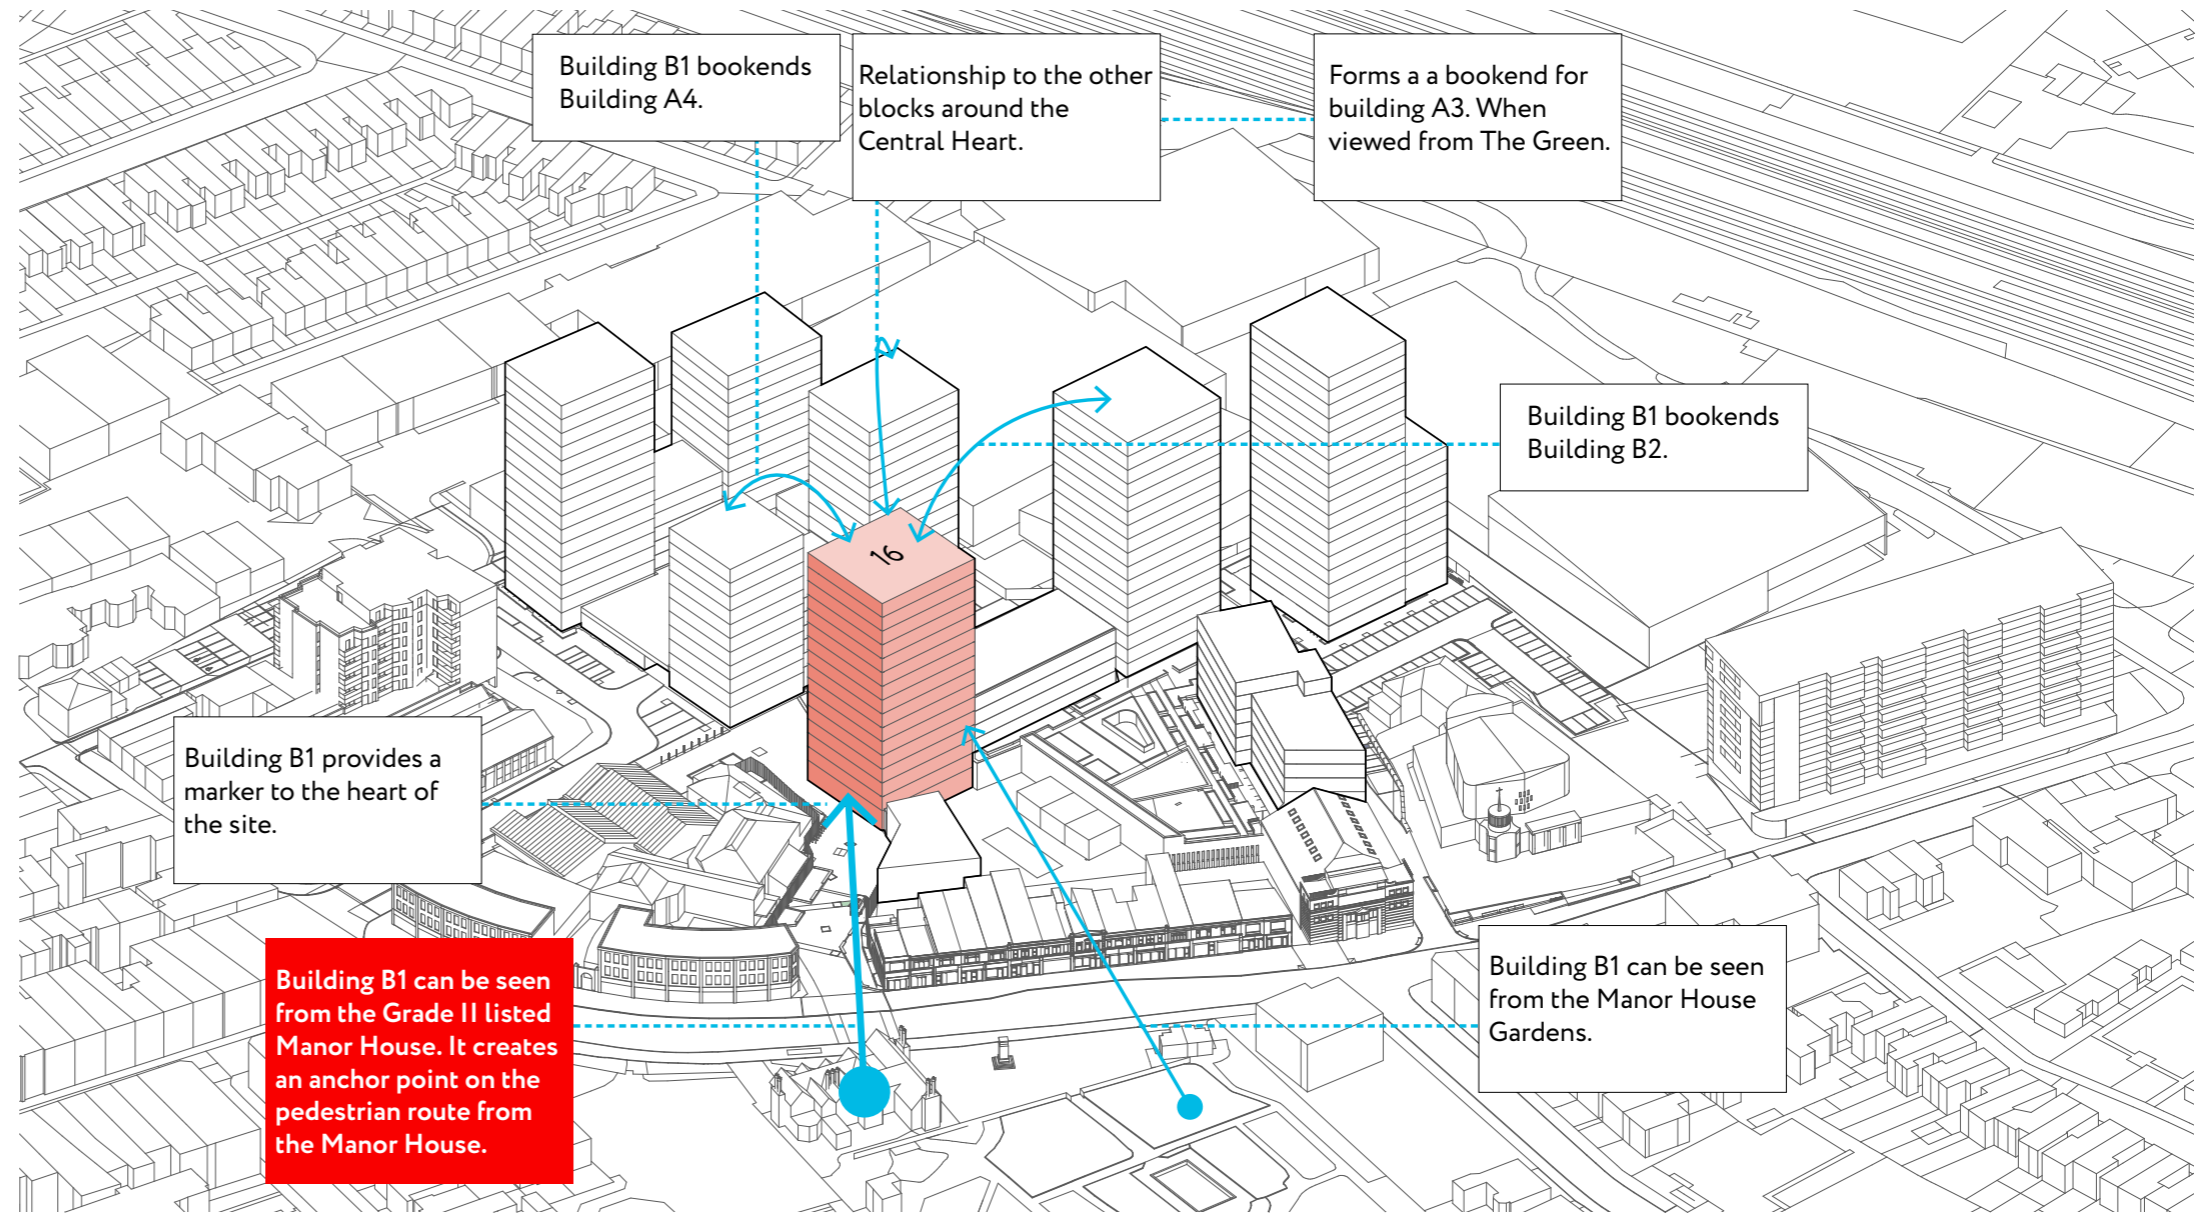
BUILDING B1 DESIGN ASSESSMENT
